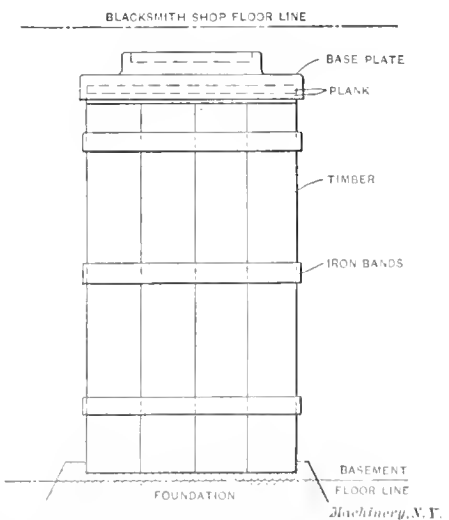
Old-style Wooden Foundations which have been replaced by the Concrete Column shown in Fig. 1.
